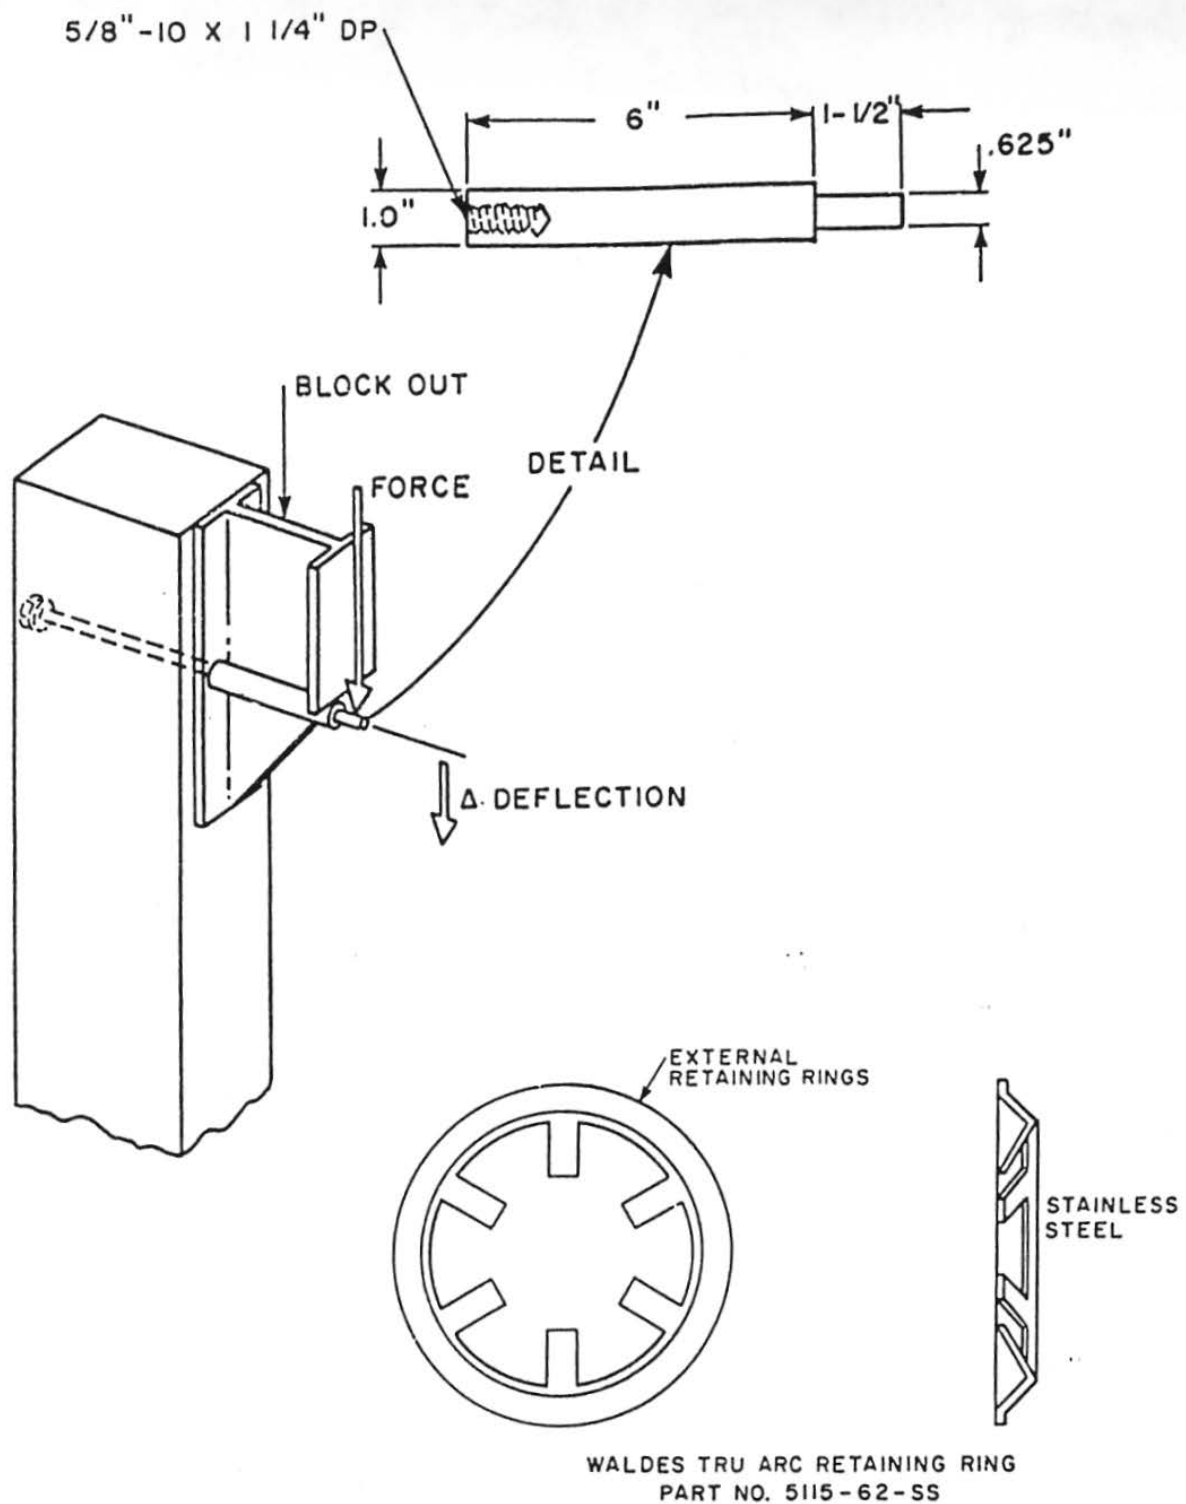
Modified Steel Blockout, Bendaway Attachment, and Retaining Ring.
